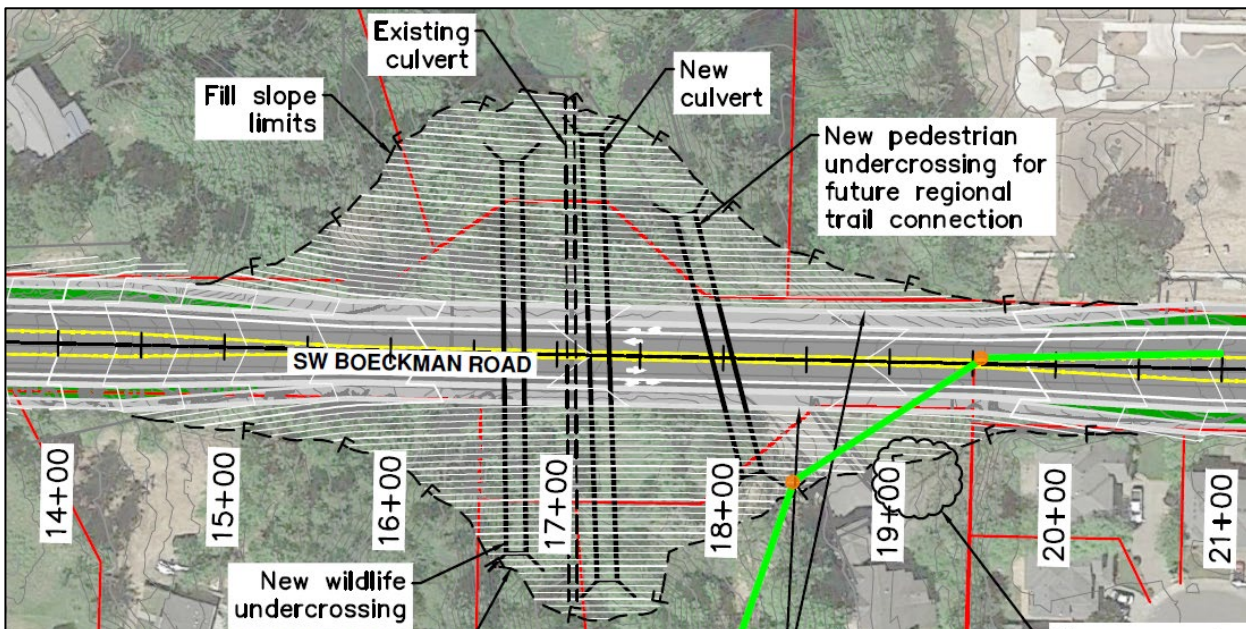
preliminary design of the embankment alternative, including culvert and tunnels
